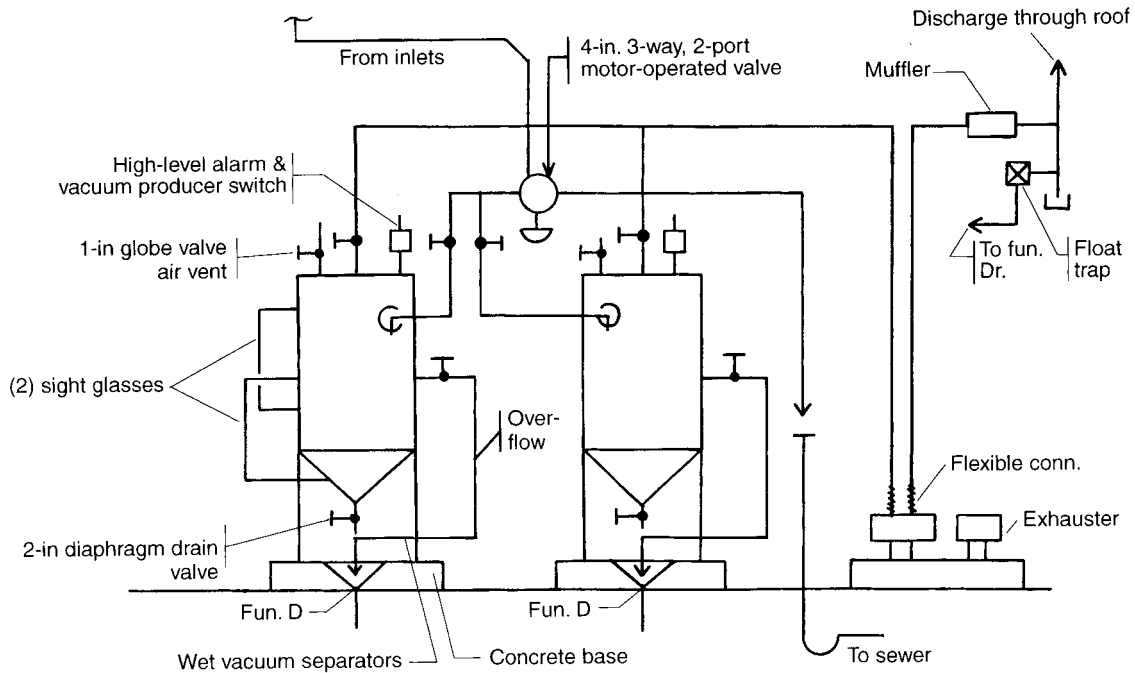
Schematic of a typical wet vacuum cleaning pump assembly.
